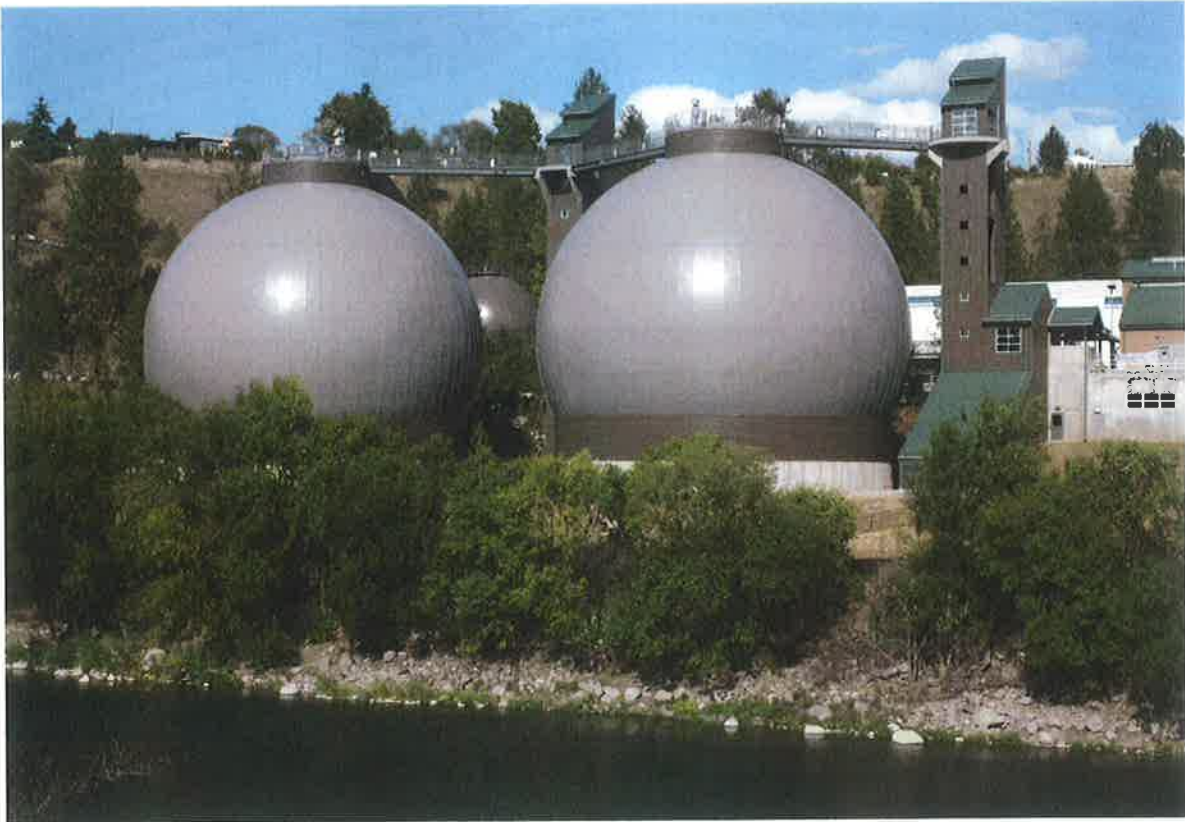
Exhibit M: Egg-shaped digester, Riverside Park Water Reclamation Facility, looking north across Spokane River.
